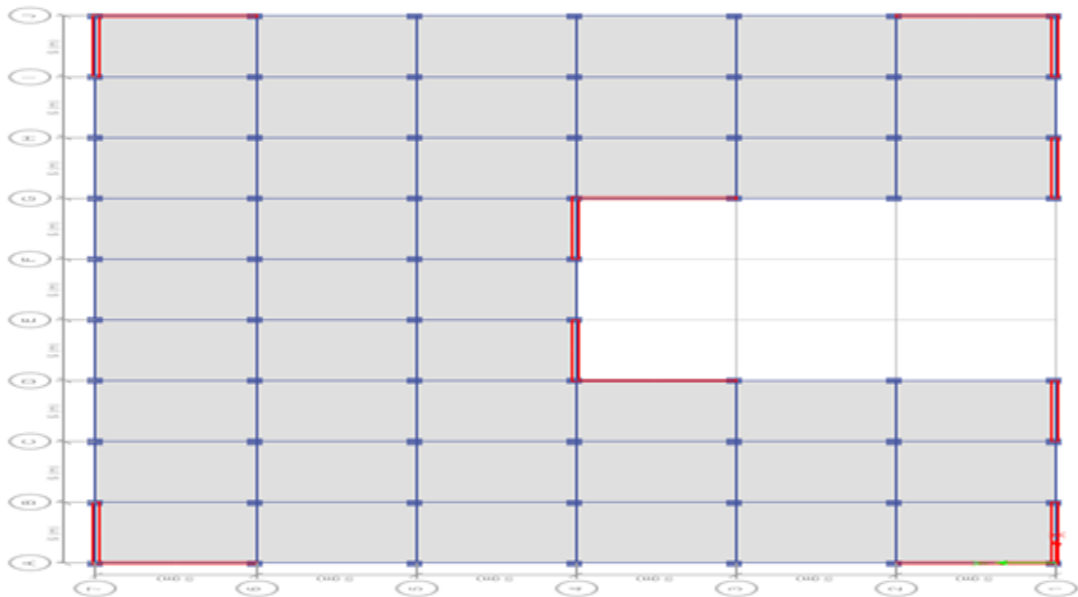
Plan view of C-Type with Shear wall at Corners with blast loading
